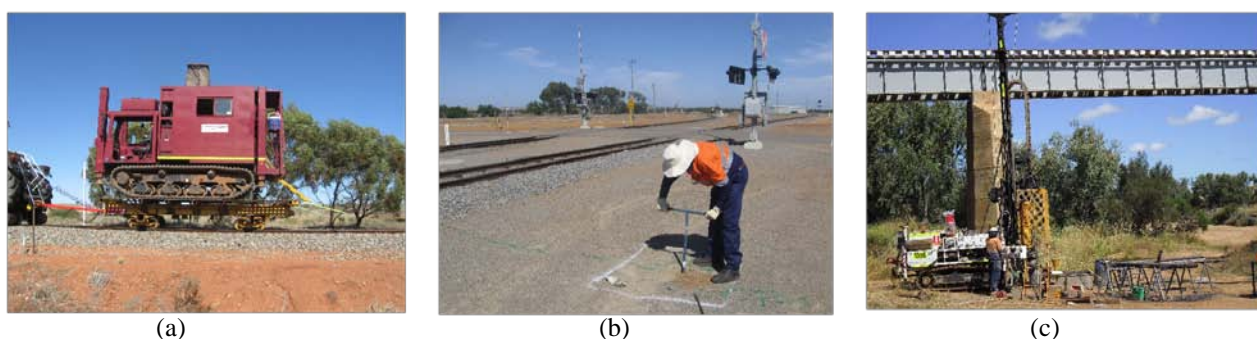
(a) CPT rig mounted on a sleeper trolley for on-formation site investigation of existing track structure; (b) DCP testing at Narngulu Yard; (c) Borehole drilling at Eradu bridge for assessment of capacity of existing pile foundations.
